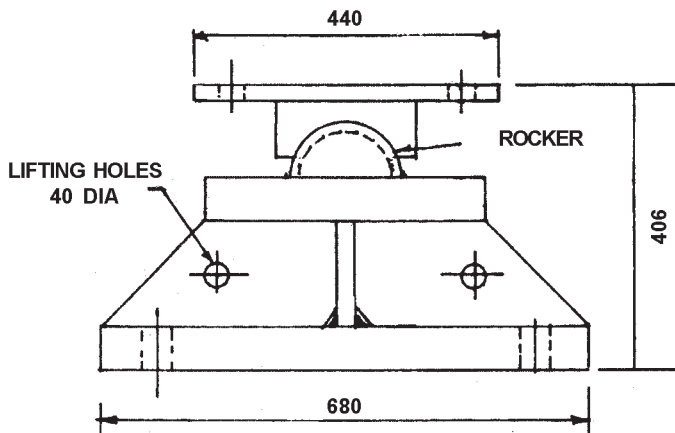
(b) Roller and rocker bearing - Fixed Bearing - Rocker end
